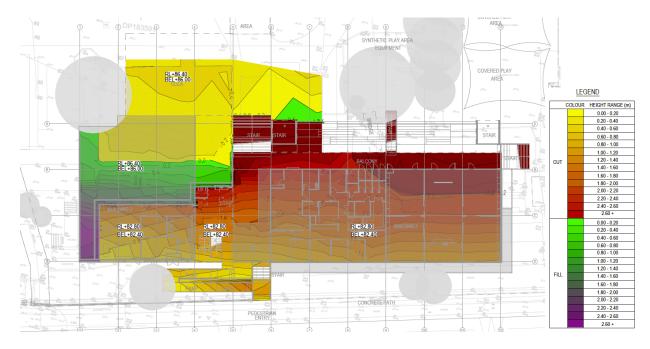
Extract of proposed cut and fill plan (Source: Aurecon)
